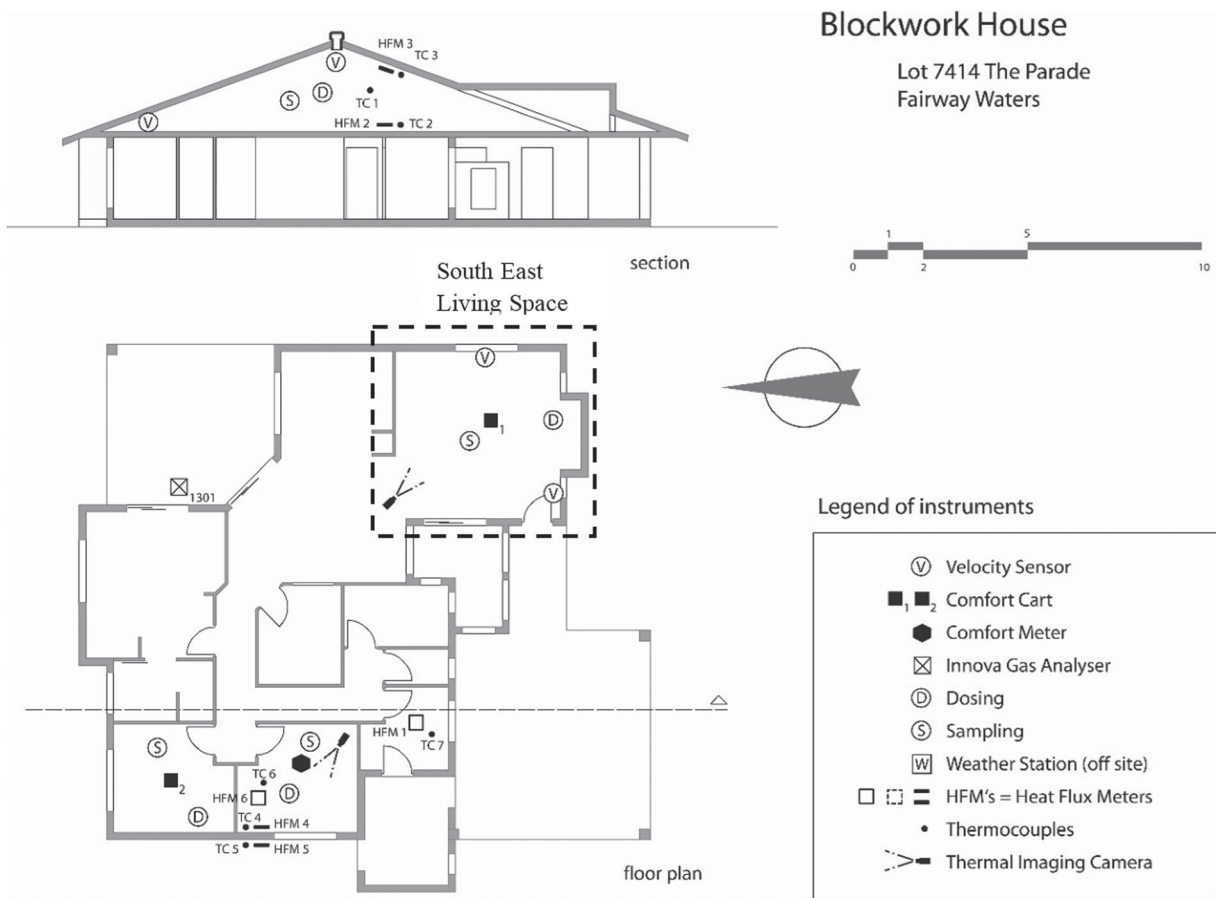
Floor plan and section of the Blockwork house with instrumentation.
